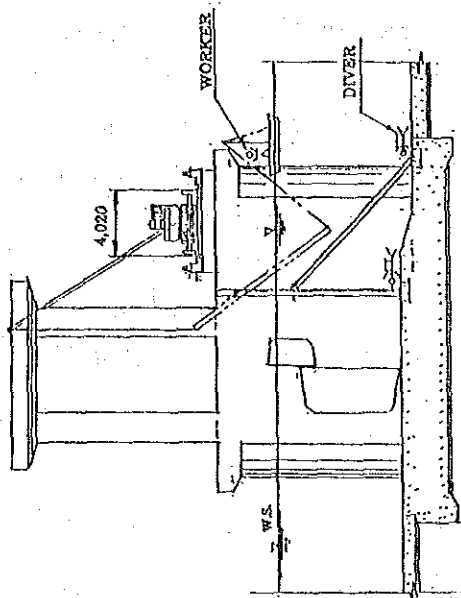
INSTALLATION PLAN FOR STOP LOG
